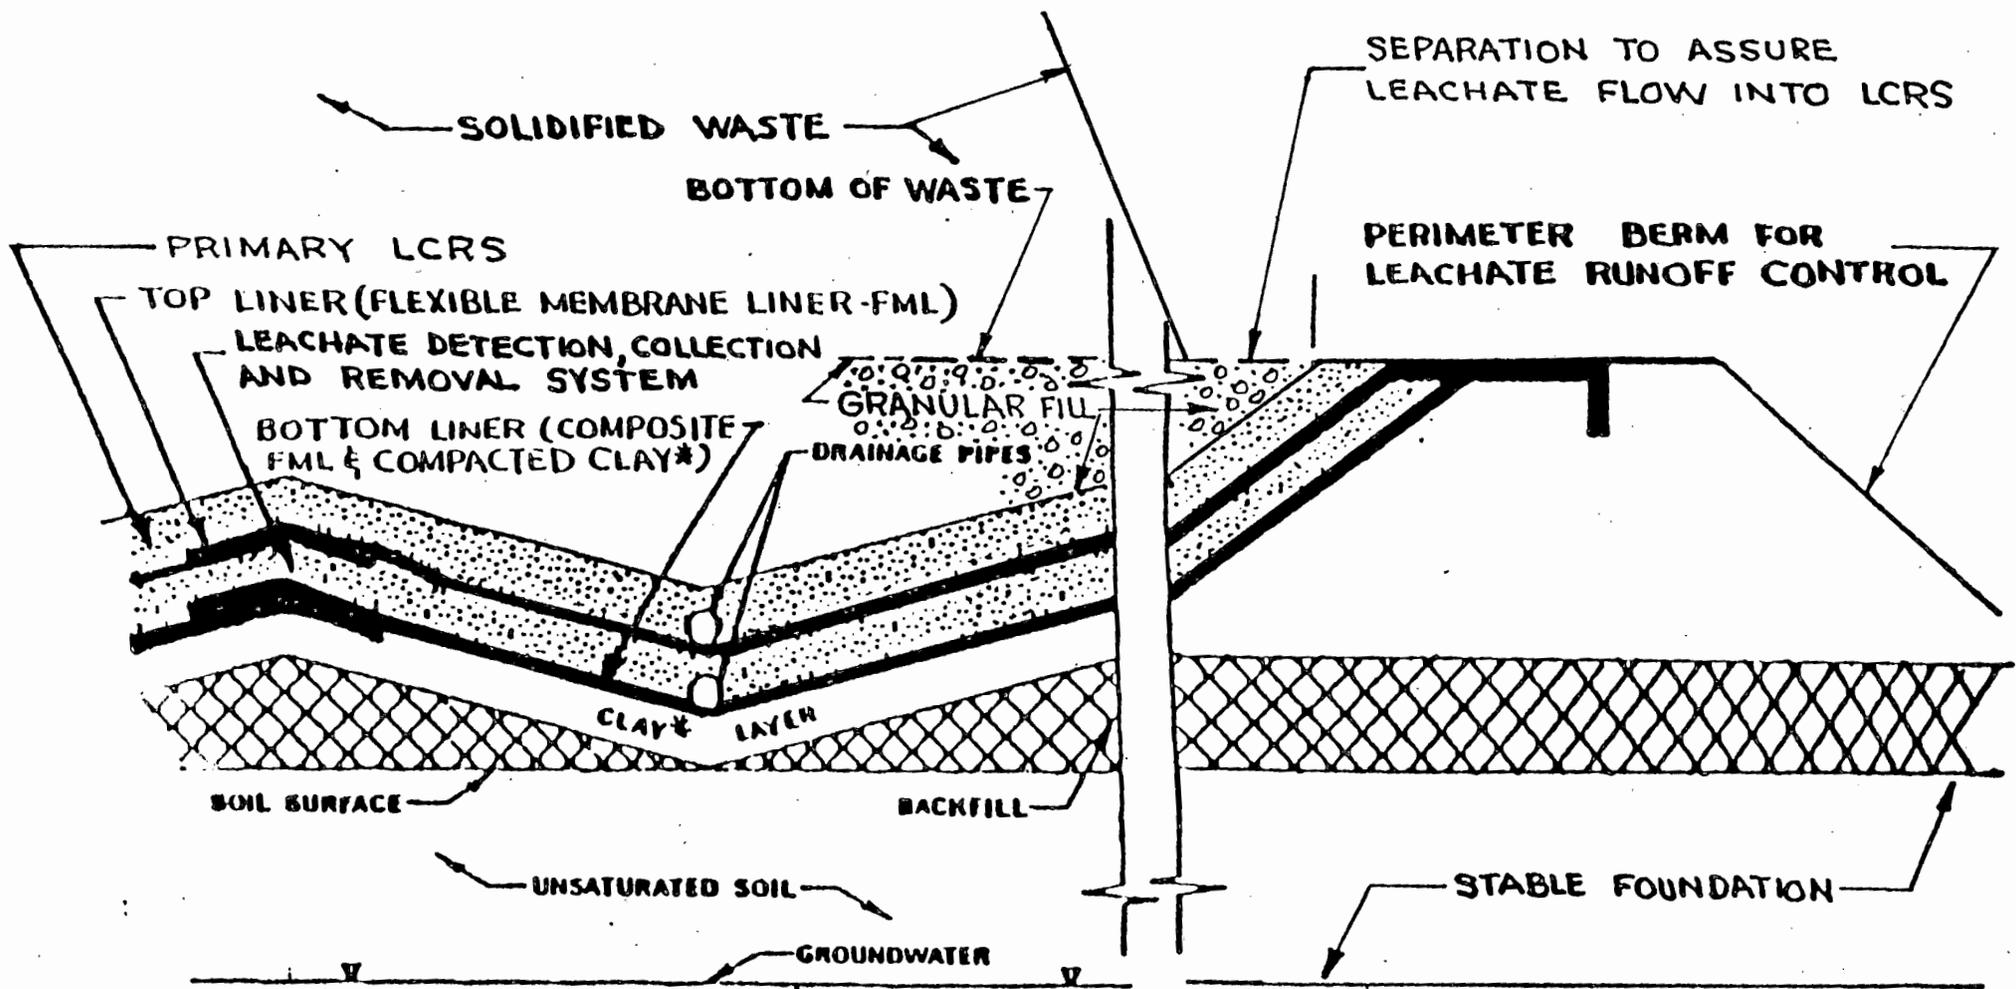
MIXED WASTE DISPOSAL FACILITY
